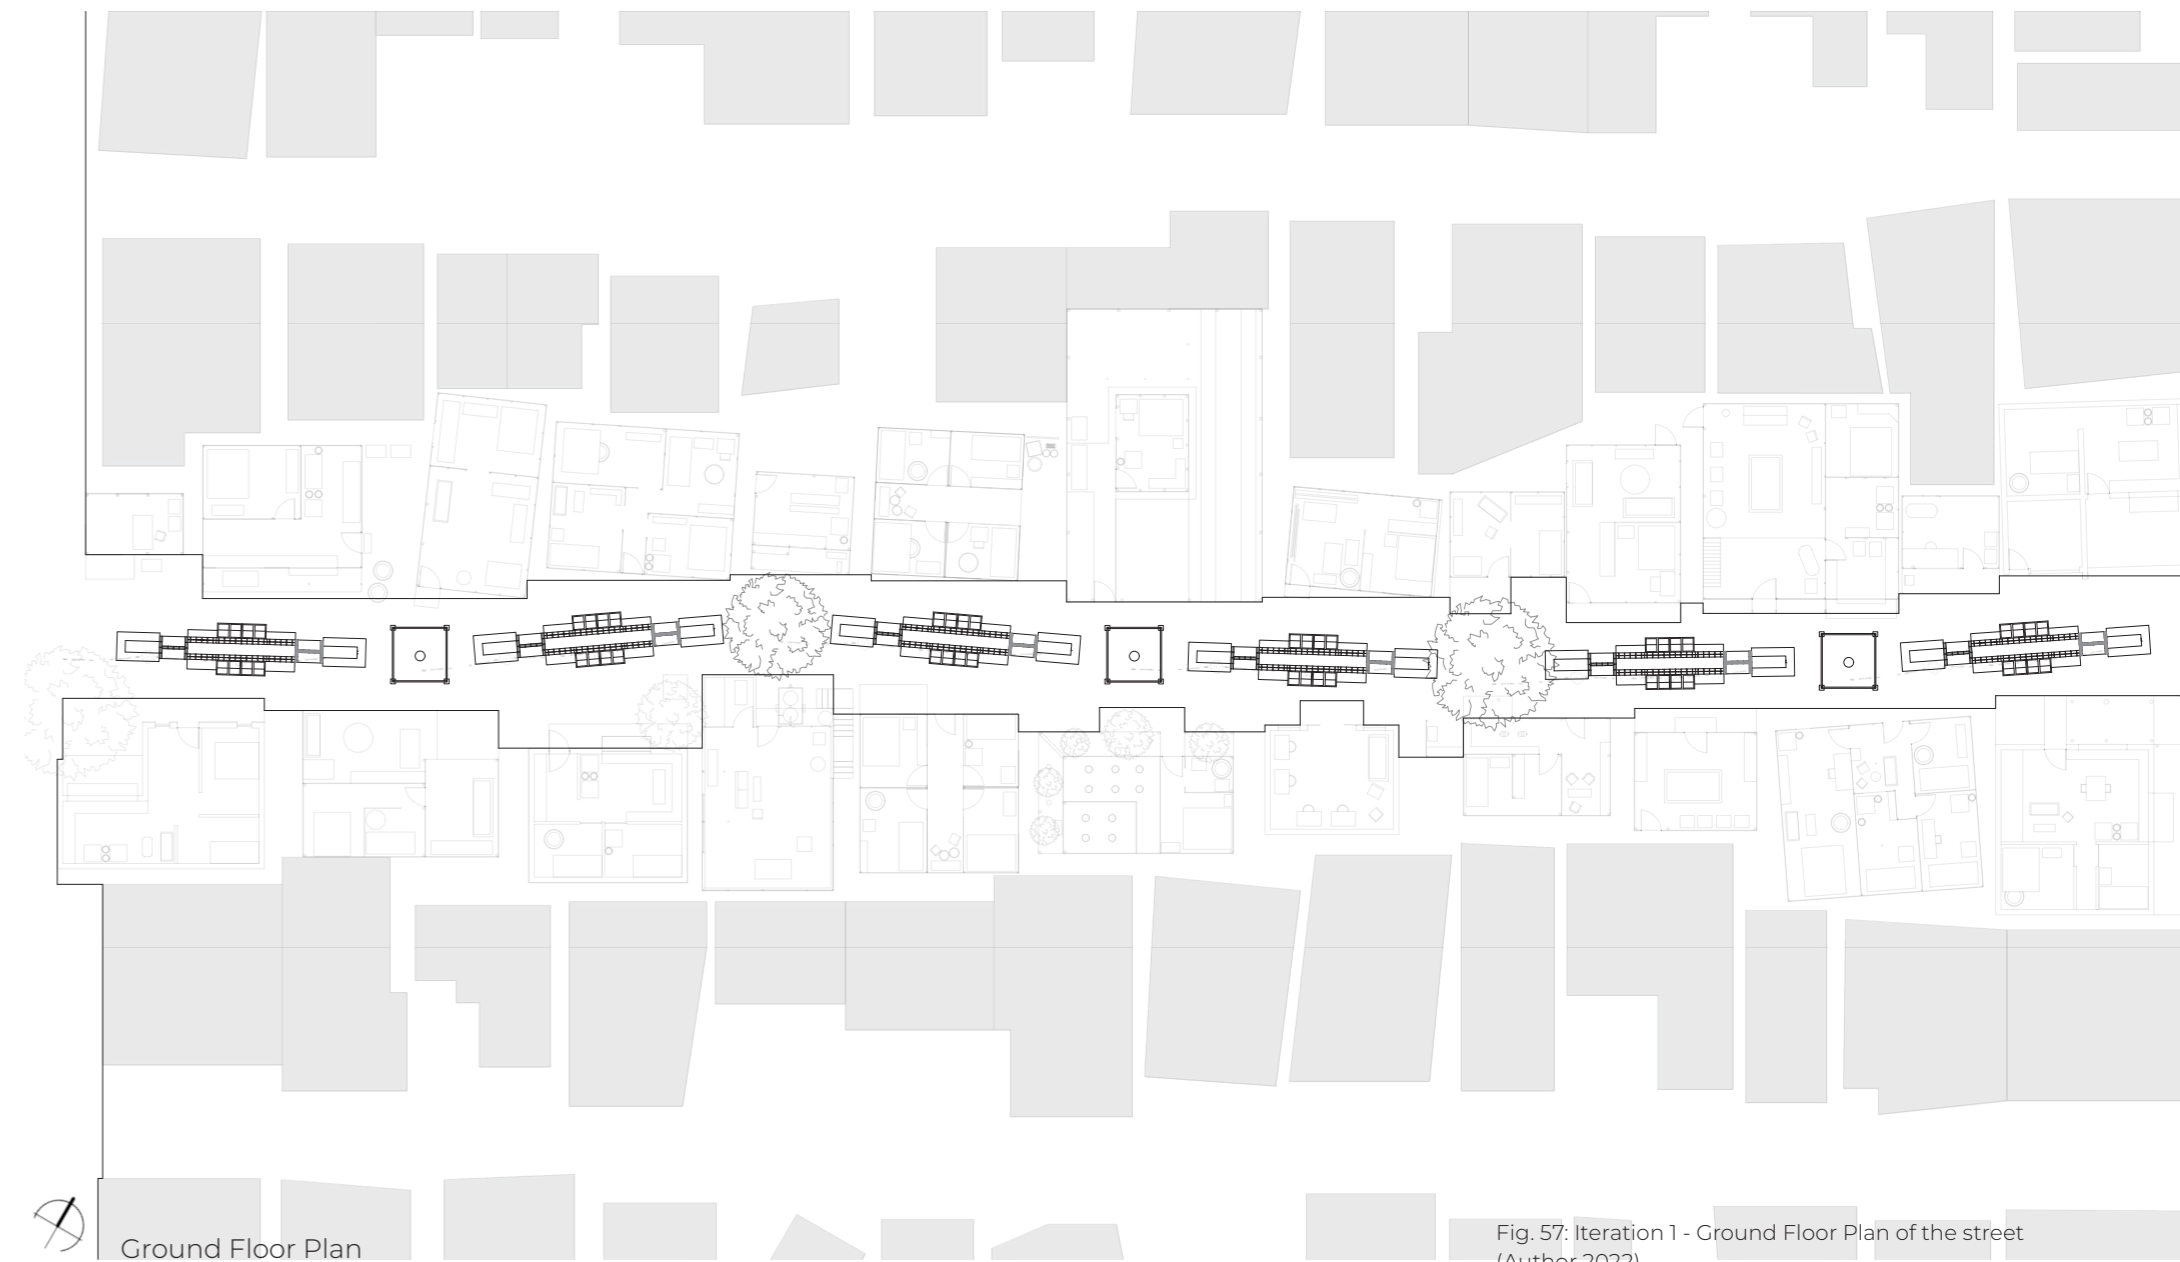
Iteration 1 - Ground Floor Plan of the street
